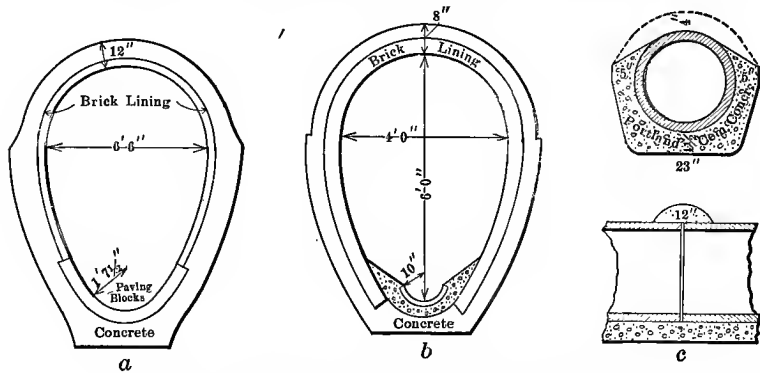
WASHINGTON, D. C., EARLY STANDARDS.
